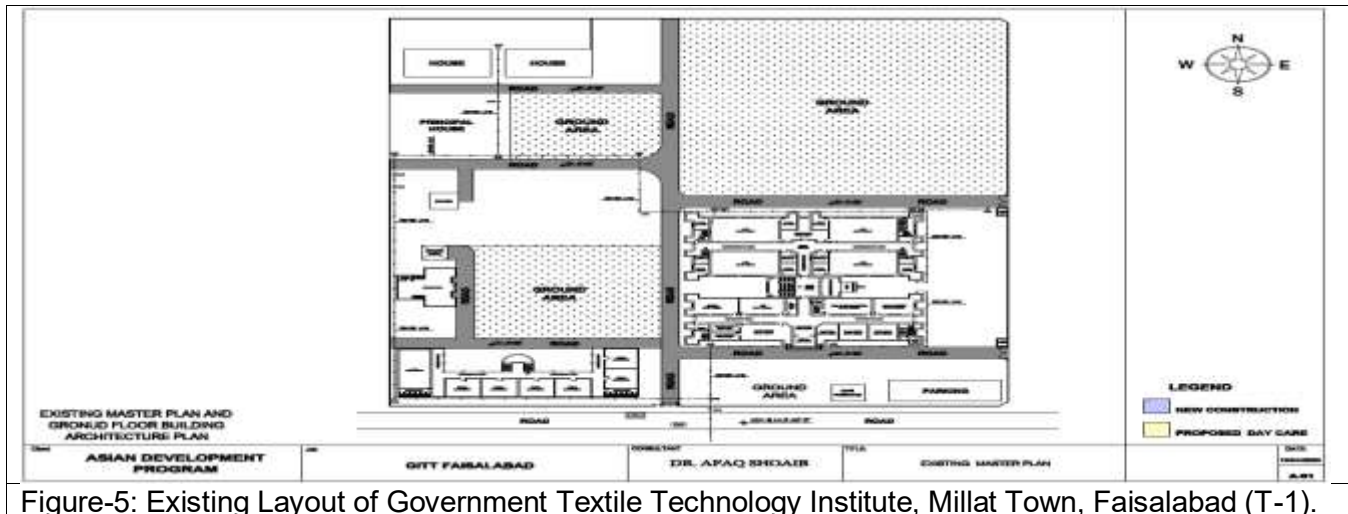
Existing Layout of Government Textile Technology Institute, Millat Town, Faisalabad (T-1).
